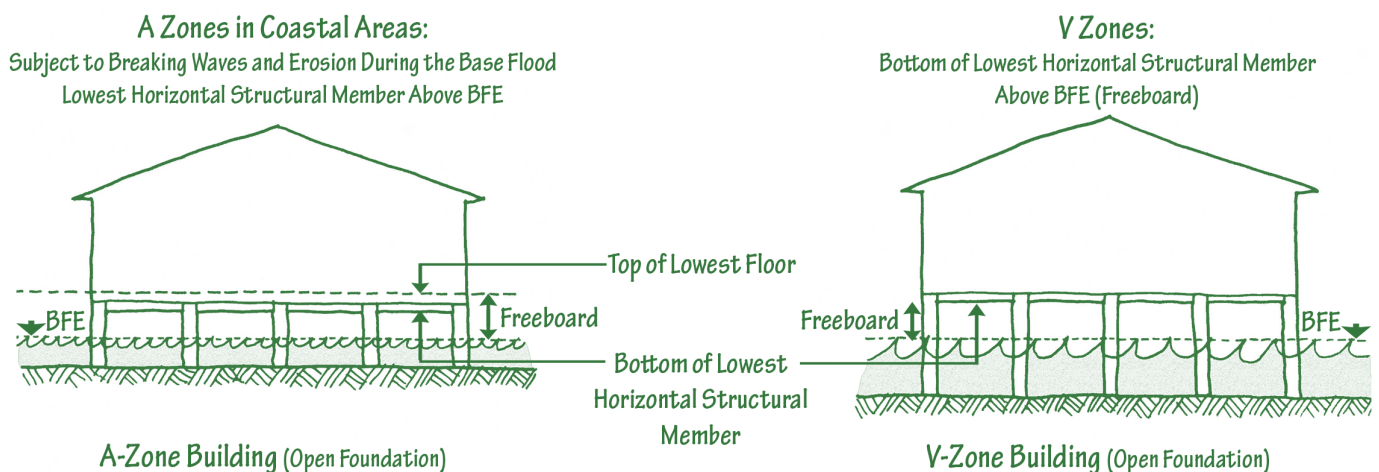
NFIP minimum elevation requirements: A Zones – elevate top of lowest floor to or above BFE; V Zones – elevate bottom of lowest horizontal structural member to or above BFE. In both V Zones and A Zones, many people have decided to elevate a full story to provide below-building parking, far exceeding the elevation requirement. See Fact Sheet No. 1.2 for more information about NFIP minimum requirements in A Zones and V Zones. (Base diagram obtained at FEMA.gov.)
